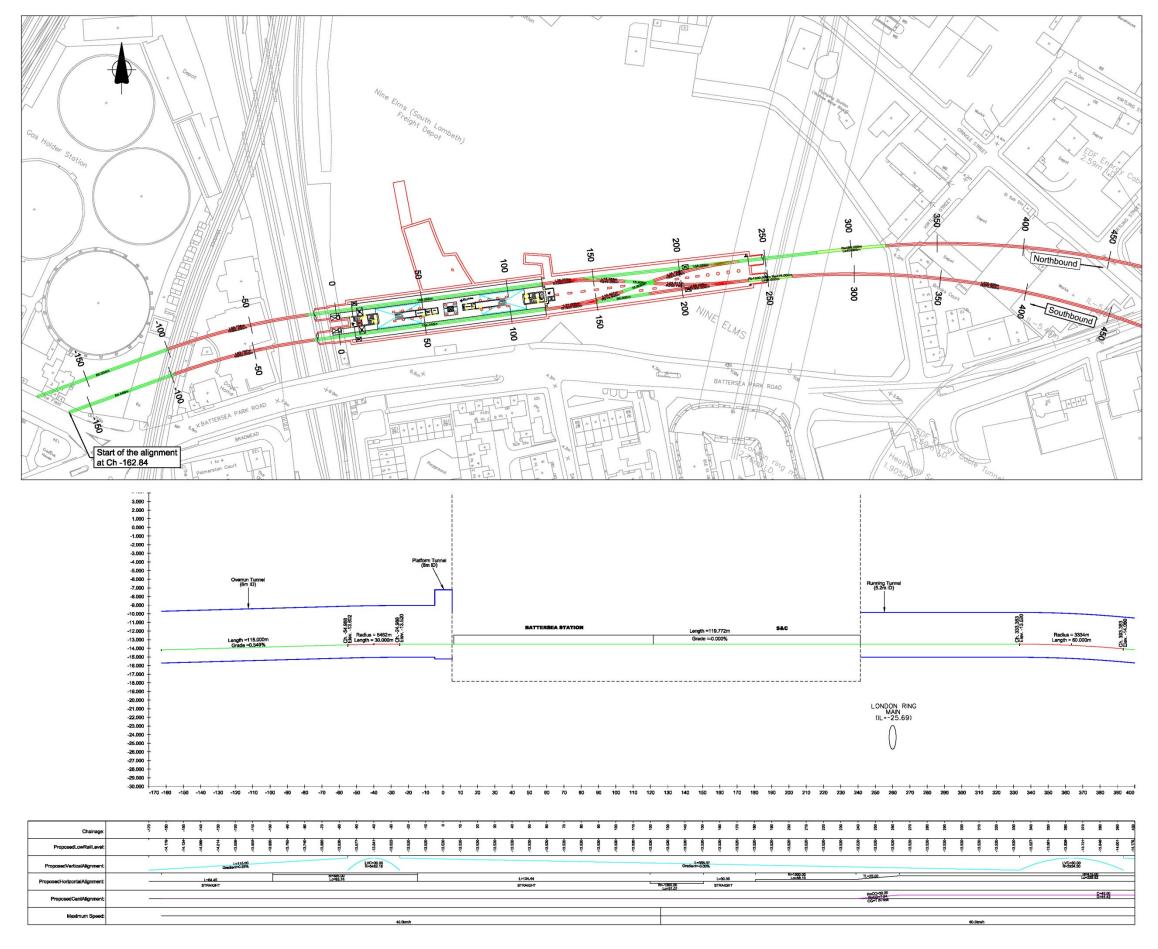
Northbound Horizontal and Vertical Track Alignment Sheet 7
